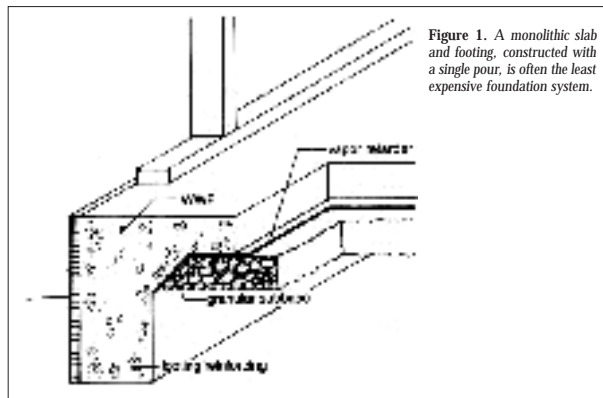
A monolithic slab and footing, constructed with a single pour, is often the least expensive foundation system.
